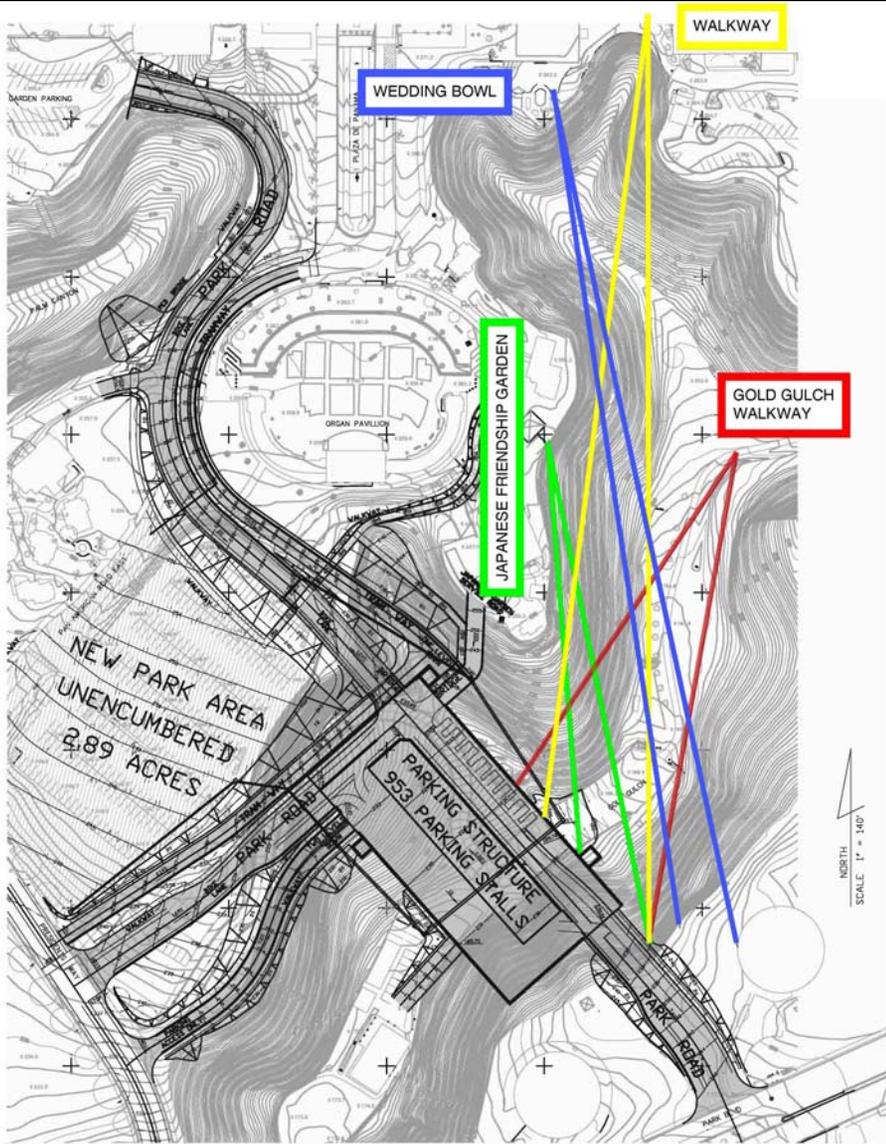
SIGHT LINES TO GOLD GULCH PARKING STRUCTURE
